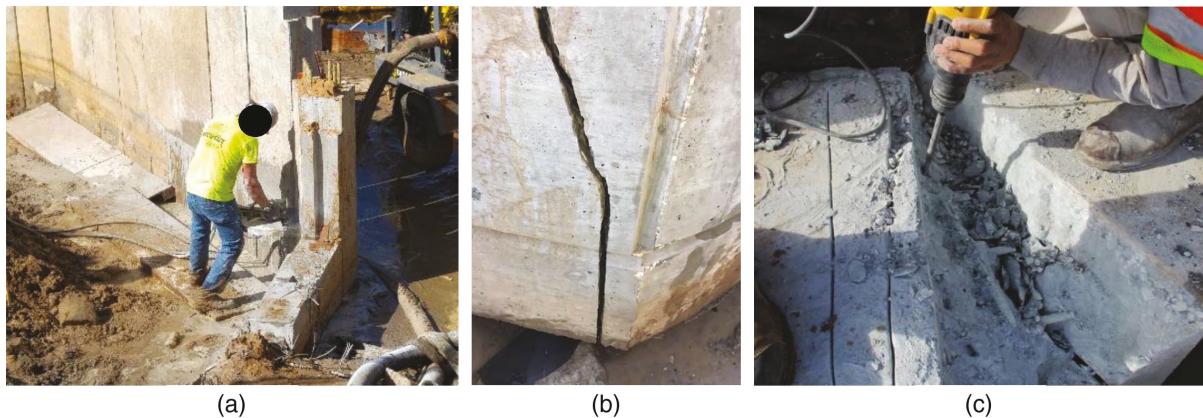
(a) RC-GFRP sheet piles saw-cut; (b) extended crack at corner cap; and (c) RC-GFRP bulkhead cap remedial action. (Images by Thomas Cadenazzi.)
